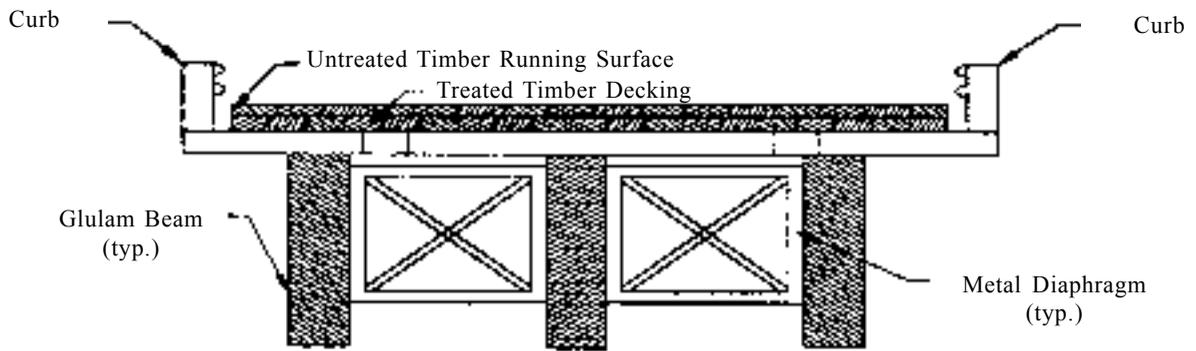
Cross-sections of typical types of bridges used on low-volume roads.
